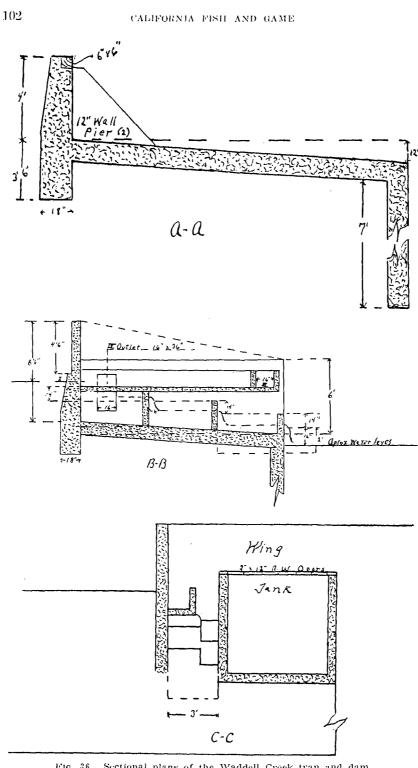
Sectional plans of the Waddell Creek trap and dam.
